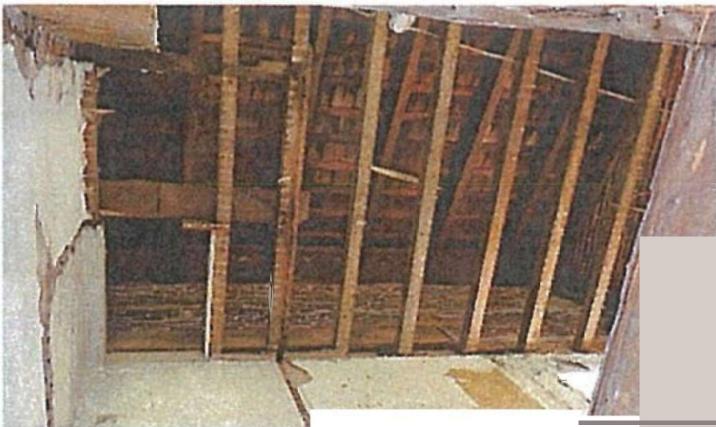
The roof and attic framing spans east-west between brick masonry bearing walls.
